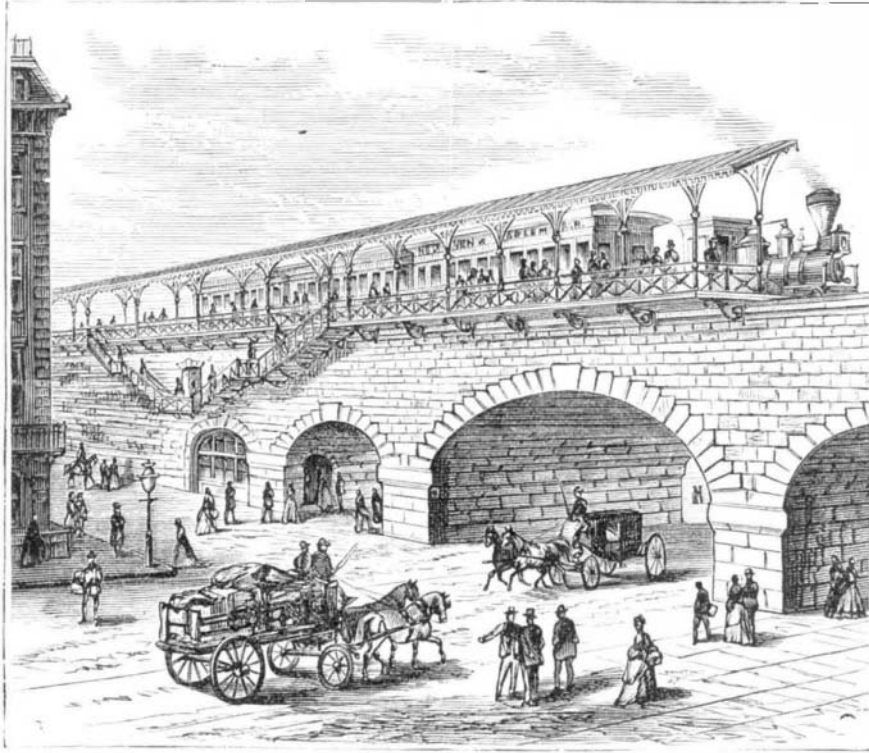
THE UNDERGROUND RAILWAY, NEW YORK CITY.—THE VIADUCT AND PASSENGER STATION AT 110th STREET.
